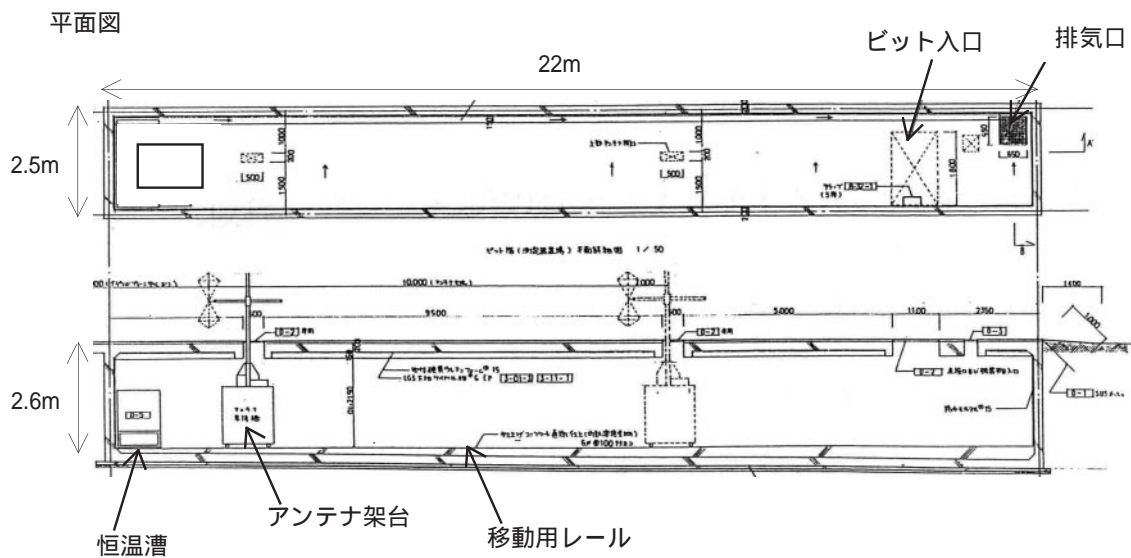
Structure of underground utility pit under the ground-plane (Horizontal and vertical views)
